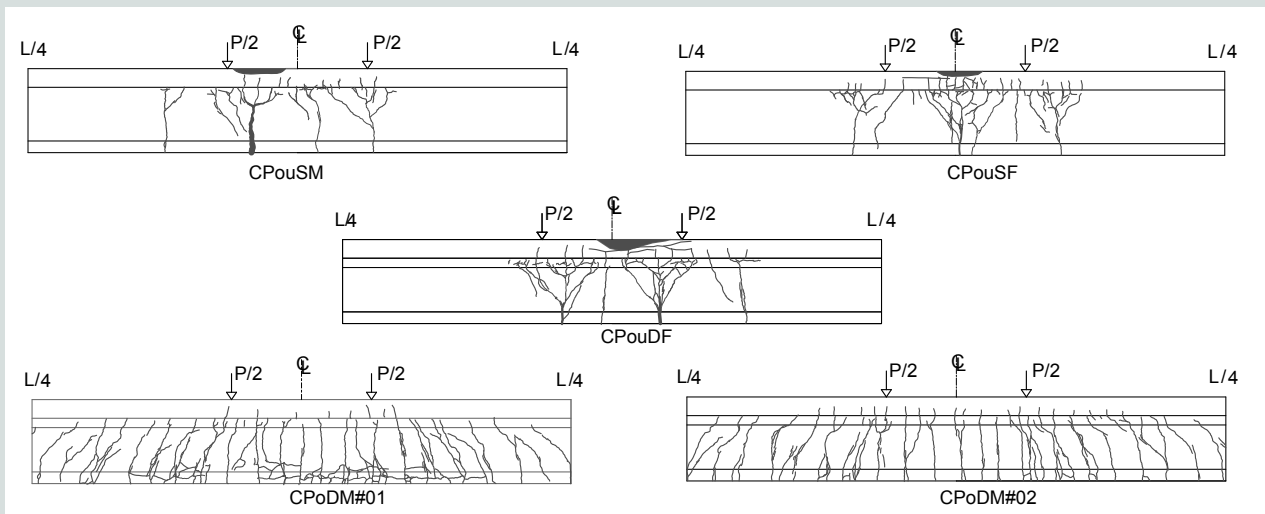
Crack patterns in the monotonic tests of the full-scale carbon-fiber-reinforced polymer (CFRP)-prestressed concrete beams at ultimate load. Note: CPouDF = CFRP post-tensioned beam with unbonded draped cables subjected to the flexural fatigue loading condition; CPouSF = CFRP post-tensioned beam with unbonded straight cables subjected to the flexural fatigue loading condition; CPouSM = CFRP post-tensioned beam with unbonded straight cables subjected to the monotonic flexure loading condition; CPoDM#01 = CFRP post-tensioned beam with bonded draped cables subjected to the monotonic flexure loading condition (first specimen of this type); CPoDM#02 = CFRP post-tensioned beam with bonded draped cables subjected to the monotonic flexure loading condition (second specimen of this type); L = length of the tendon between the anchorages; P = load.
